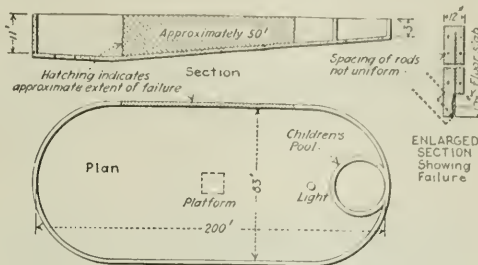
PLAN OF POOL AND SECTION OF WALL
